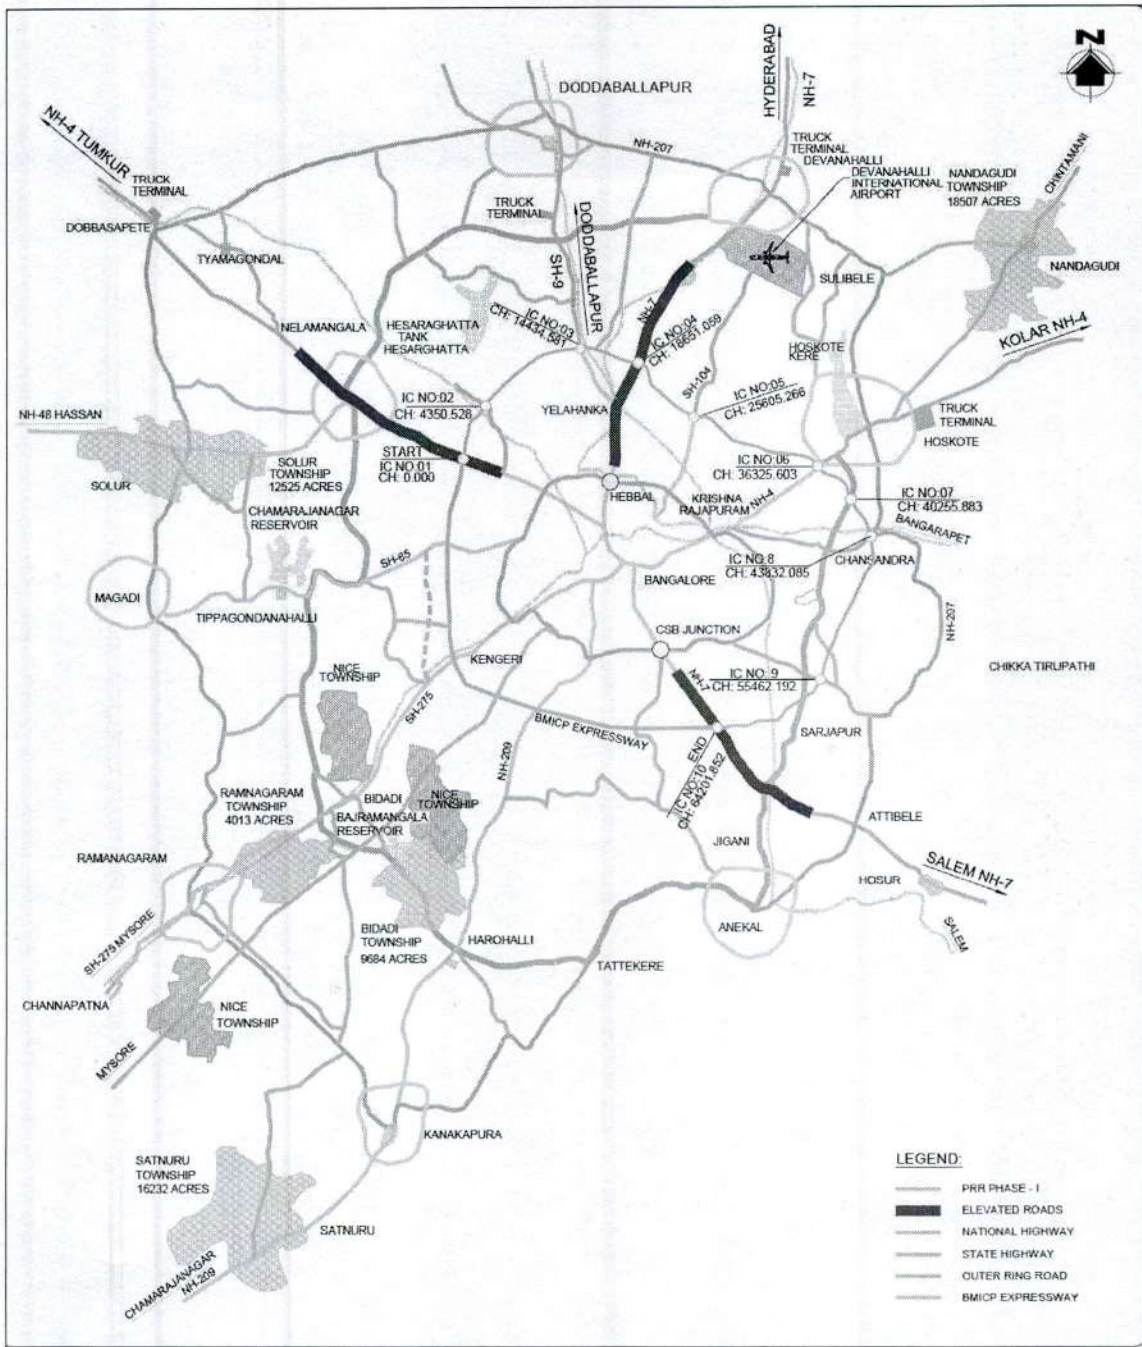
Key Plan of PRR with existing Elevated Roads
